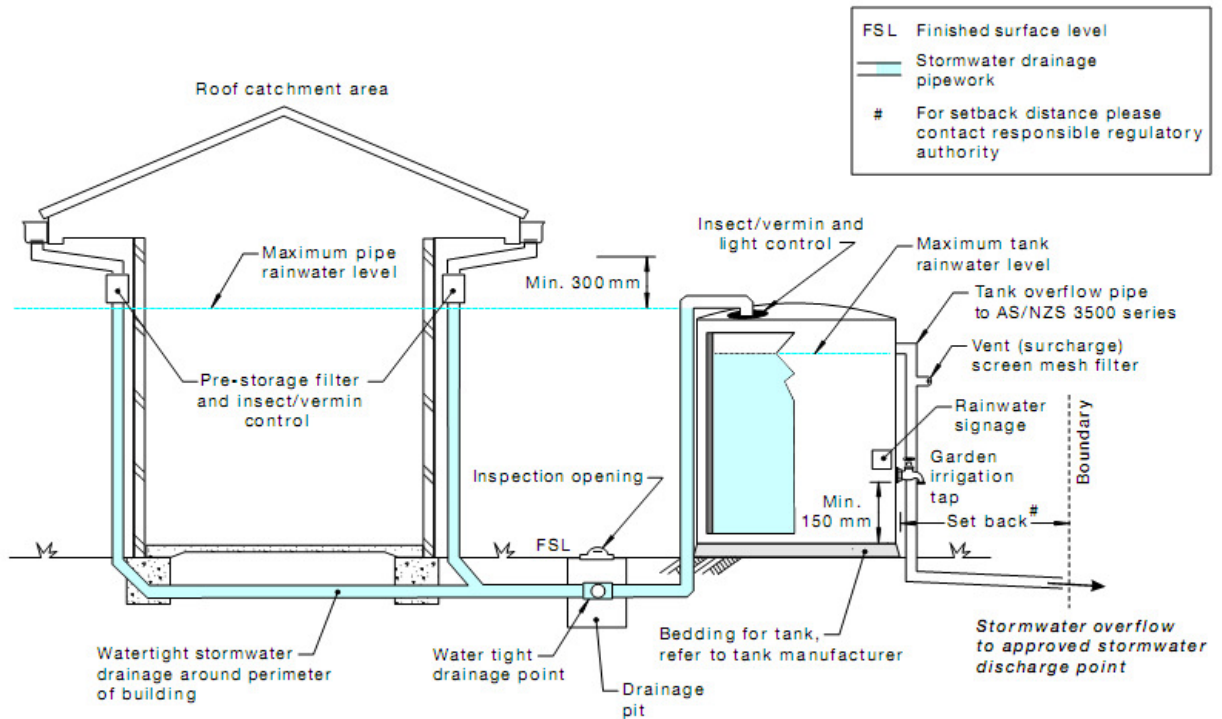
Typical Above-ground Rainwater Tank Installation (charged system) (National Water Commission, 2008)
